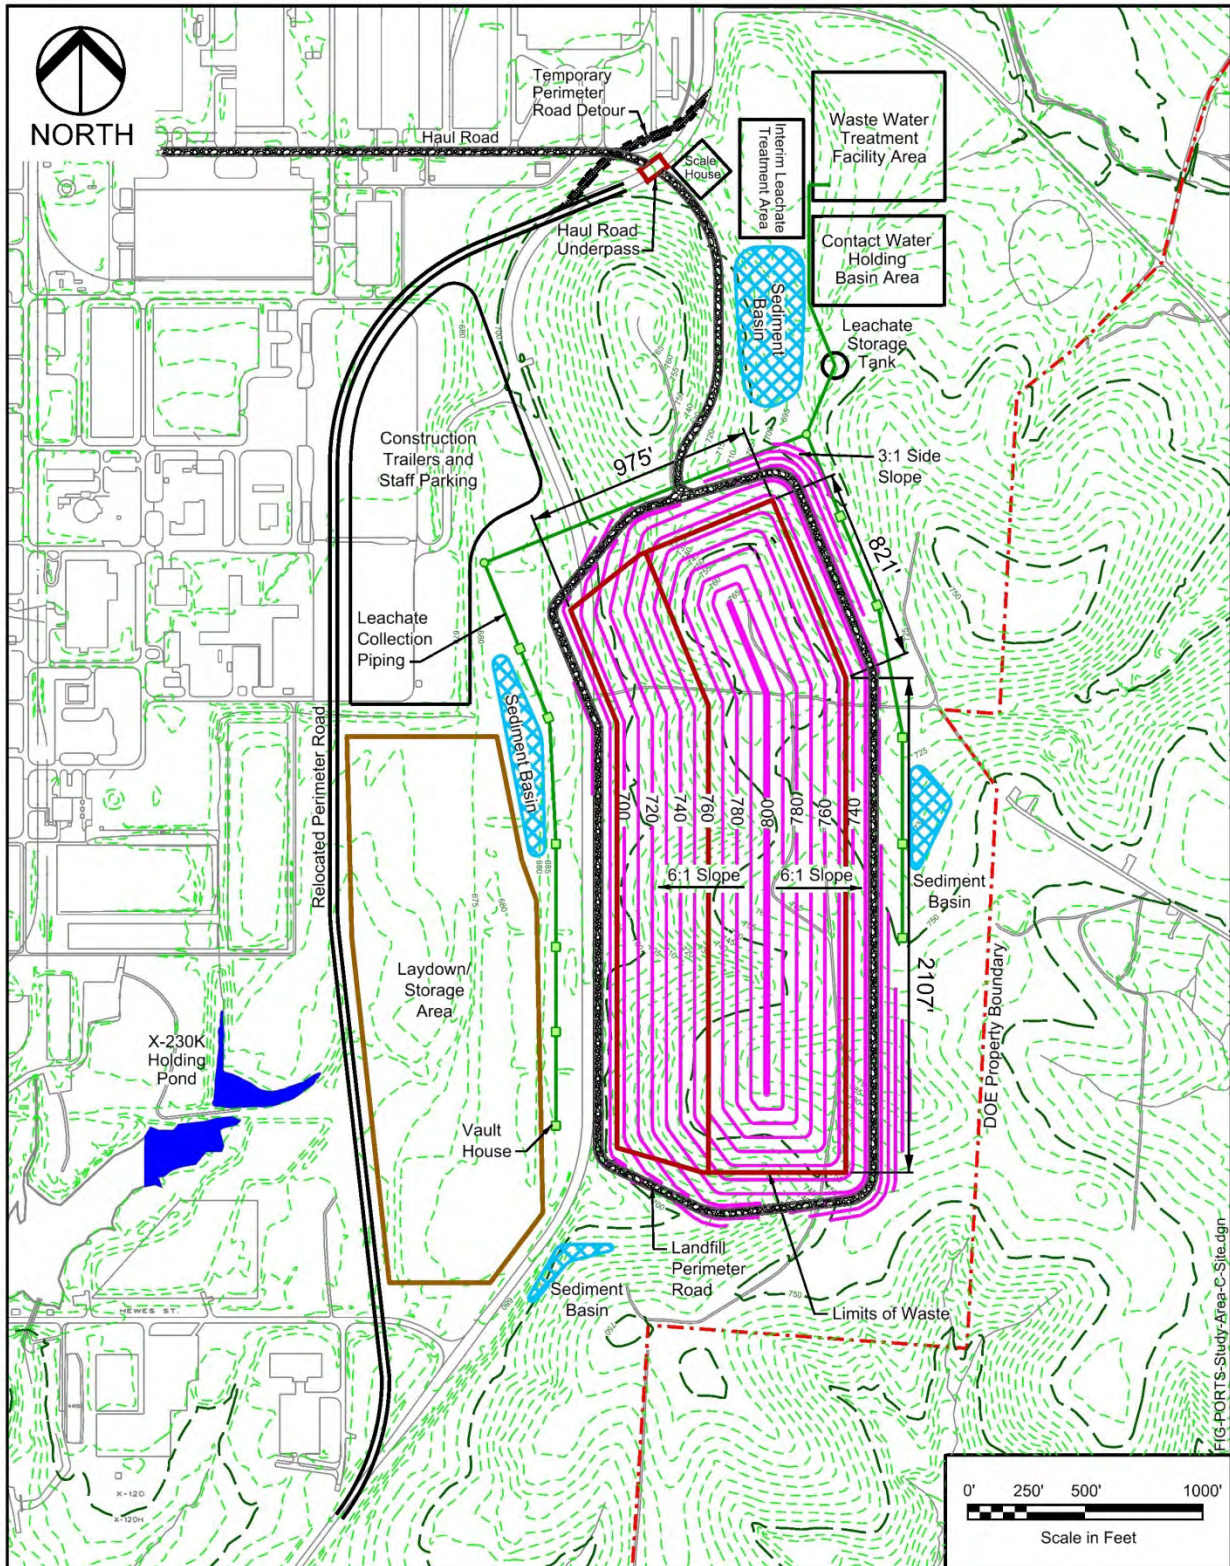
Landfill Plan View – Finished Grading Plan for Study Area C at PORTS
